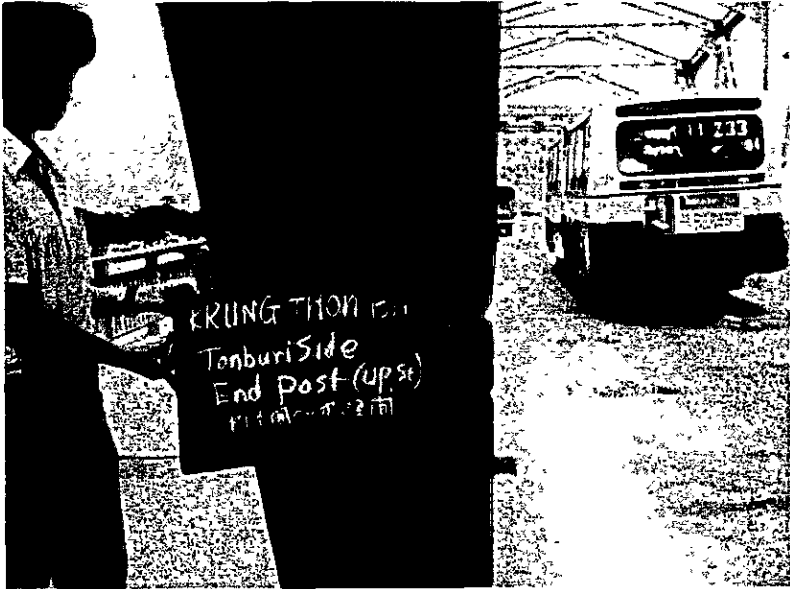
Clashed Signs of Cars at the End Post of the Trussed Beams
